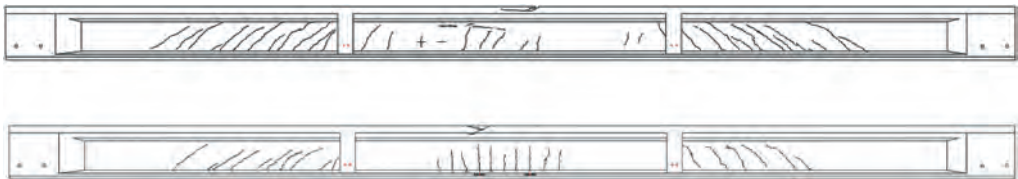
Cracks pattern after failure. top: girder B05. bottom: girder B09.
